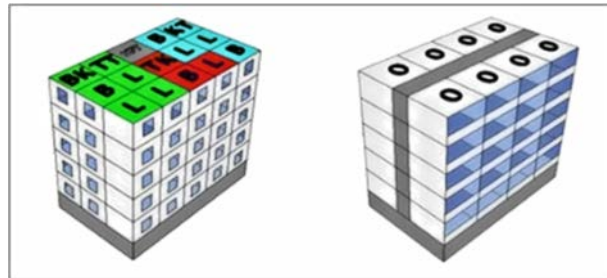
Building models of residential (left) and office (right) buildings. Legend: B (bedroom); L (living room); K (kitchen); T (toilet); O (office).
